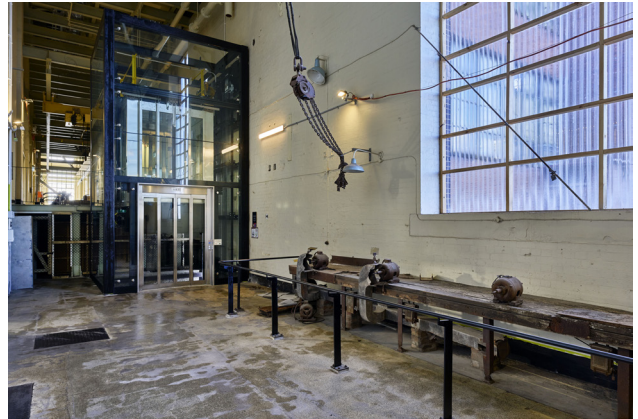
New glass elevator installed in the Pump House, 2024 (courtesy of Chris Bennett: Evolving Picture).
